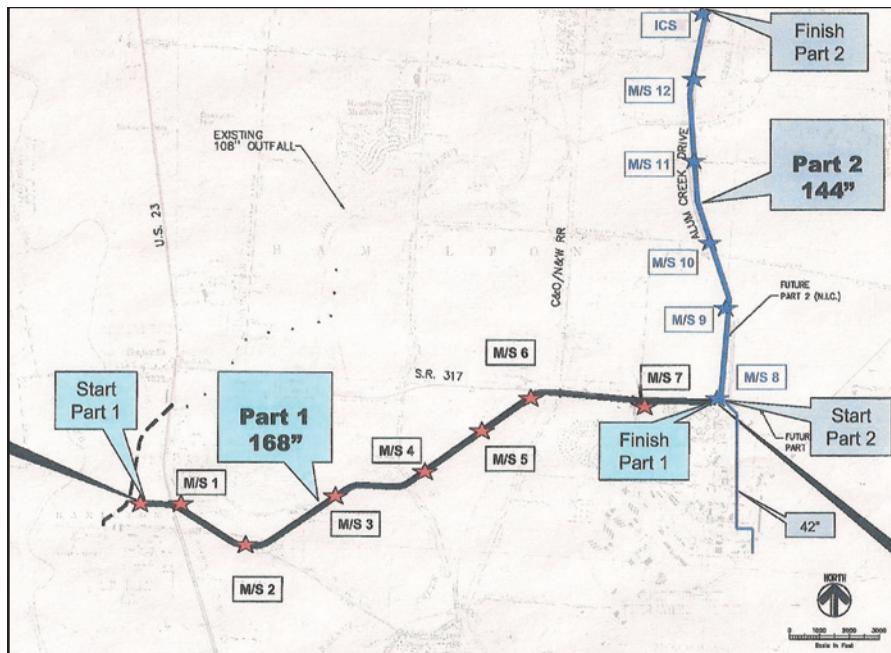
Plan view of both tunnels. Access to the tunnels could be obtained via twelve shafts, the wastewater treatment plant, and an interconnect structure (ICS) at the north end of the twelve-foot diameter tunnel. Primary access was achieved through M/S 1, M/S 8, and the ICS because they provided the largest surface openings.
